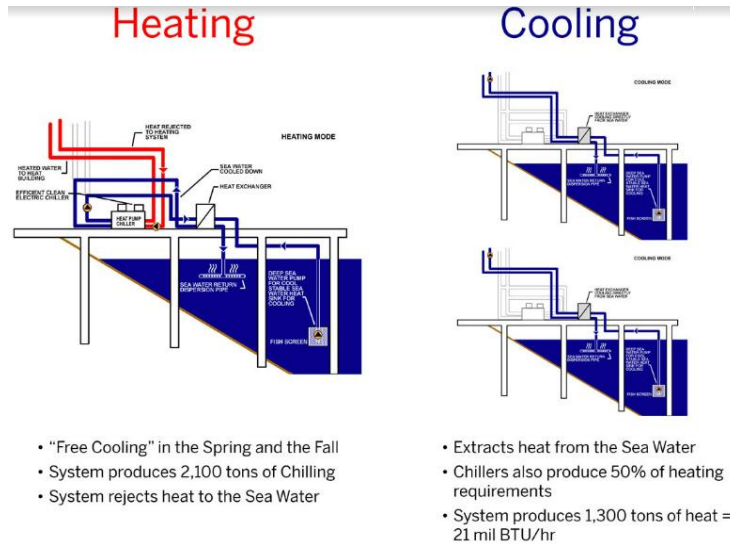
Heating and cooling system of the convention center (www.lmnarchitects.com)
